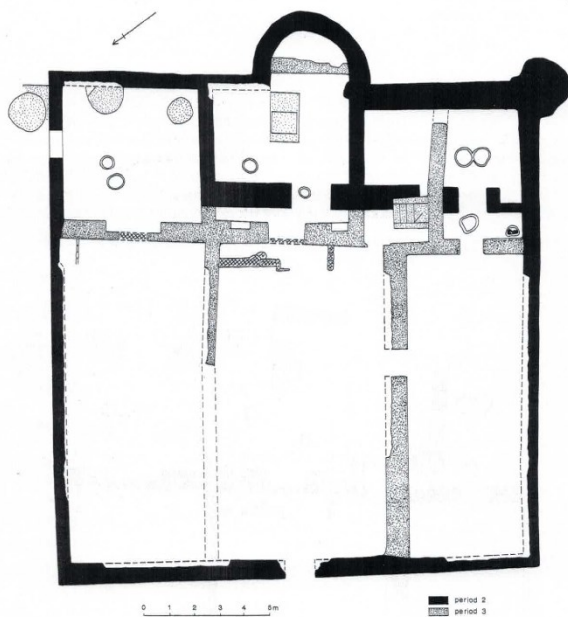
Plan of the excavated building at Khirbet Deir Situn. Drawing by J.E. Curtis.
